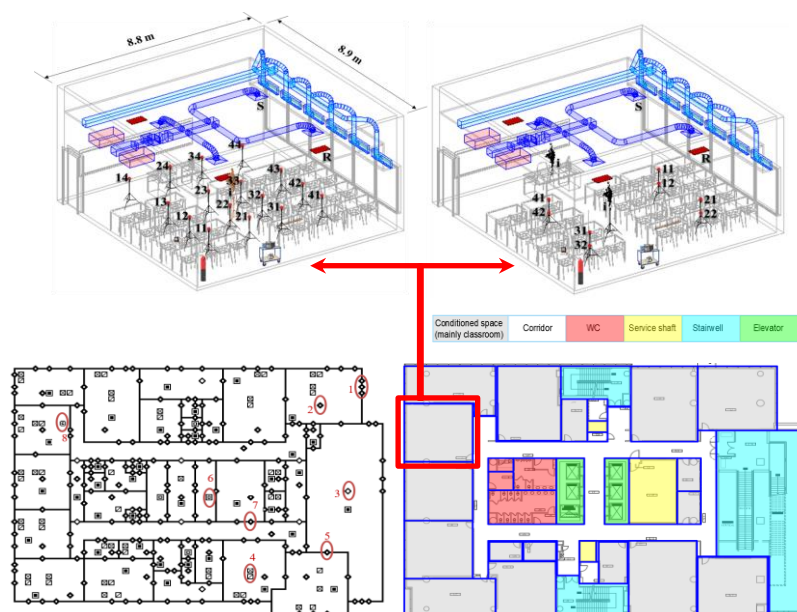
Architectural layout and CONTAM model of the 5th floor, Longueuil Campus, Université de Sherbrooke, Montreal, Canada (1. External wall leakage; 2. Floor leakage; 3. Stair leakage; 4. AHU supply and return; 5. Internal wall leakage; 6. Elevator shaft leakage; 7. Door leakage; 8. CO₂ injection source). Highlighted in red, are 3D views of the selected classroom showing two setups of tracer tests.
